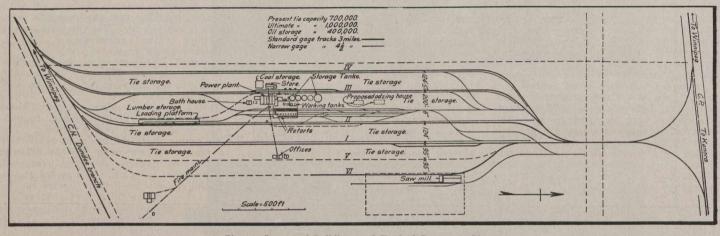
Layout of Buildings and Yard of Creosoting Plant.
